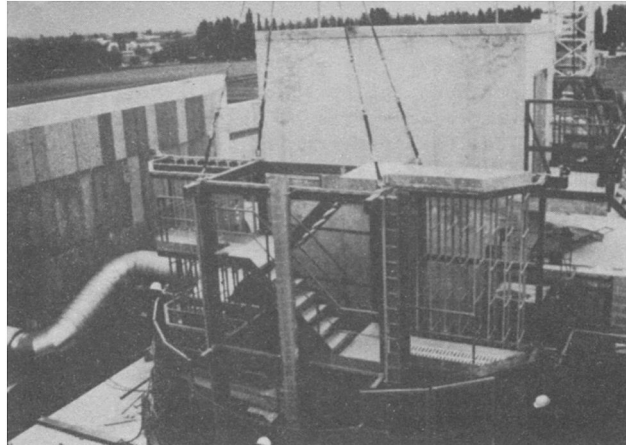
Topping-out of the PM prefabricated units prior to services (cable, pipe etc...) installation
